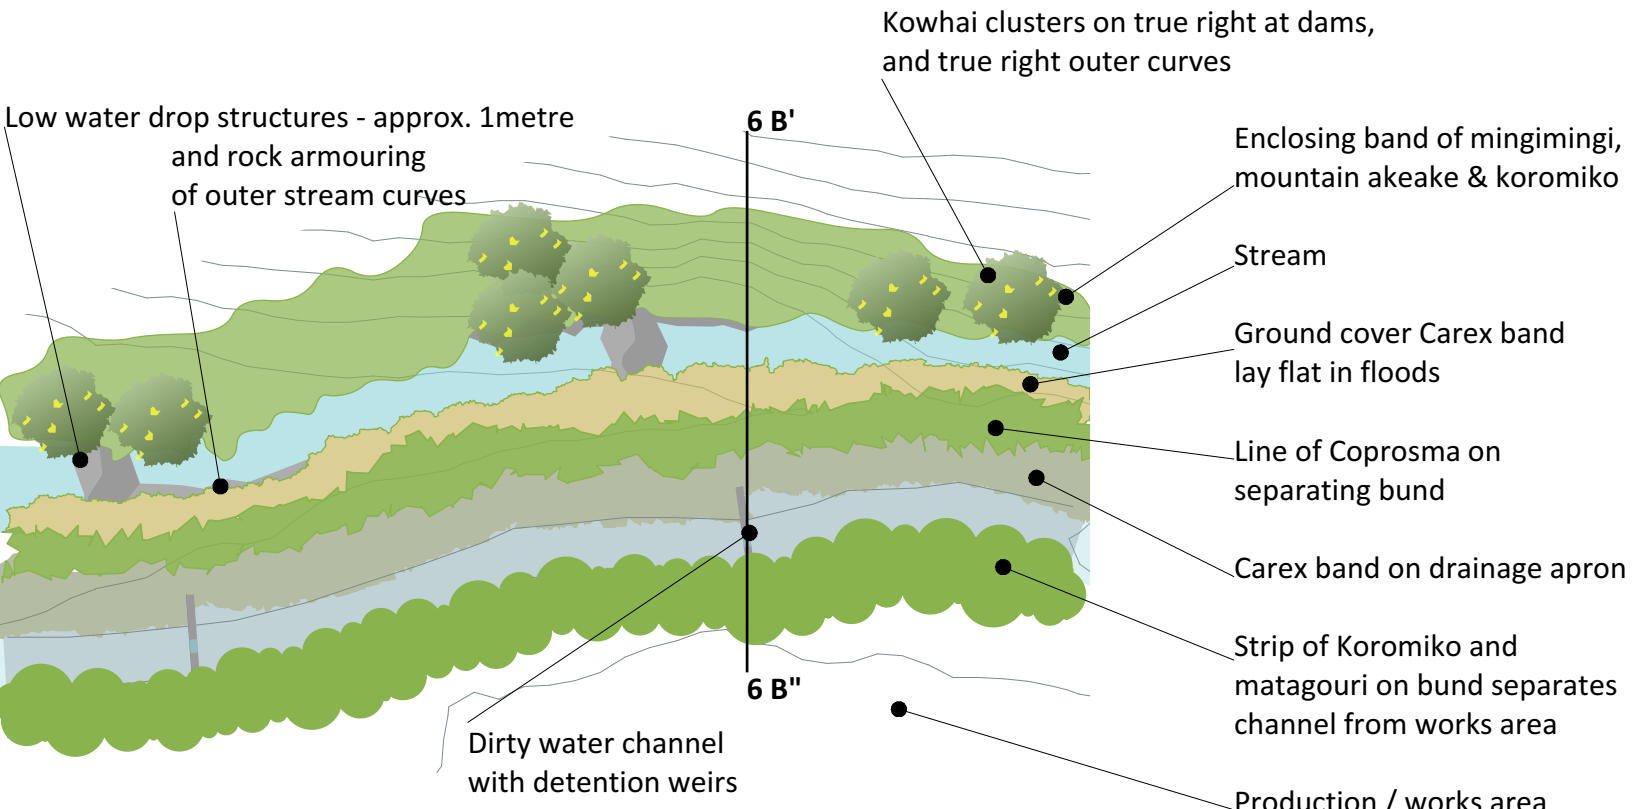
, Site 6 B, Lowland reach plan typical, 1:300 @ A3
